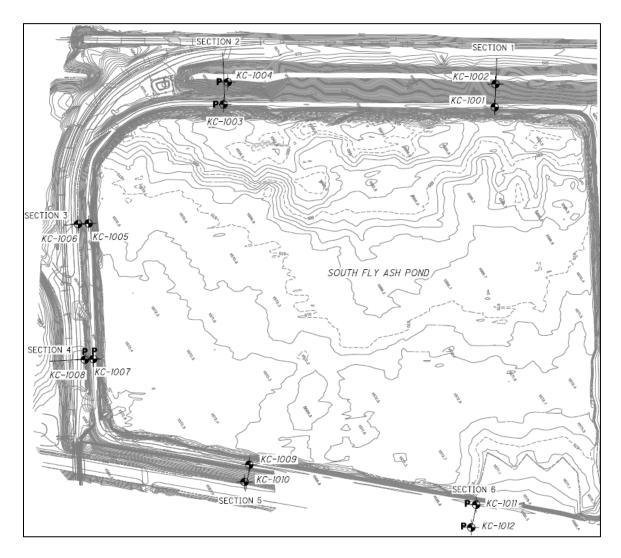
Kyger Creek Station South Fly Ash Pond – Plan View of Cross Sections (DLZ, 2015)
